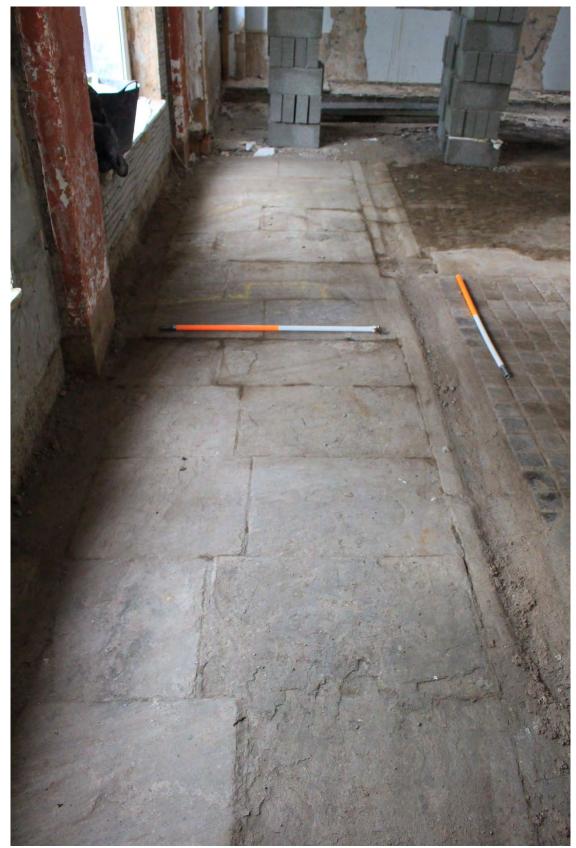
Detail of the flagstone section of the floor in G1, looking north.
